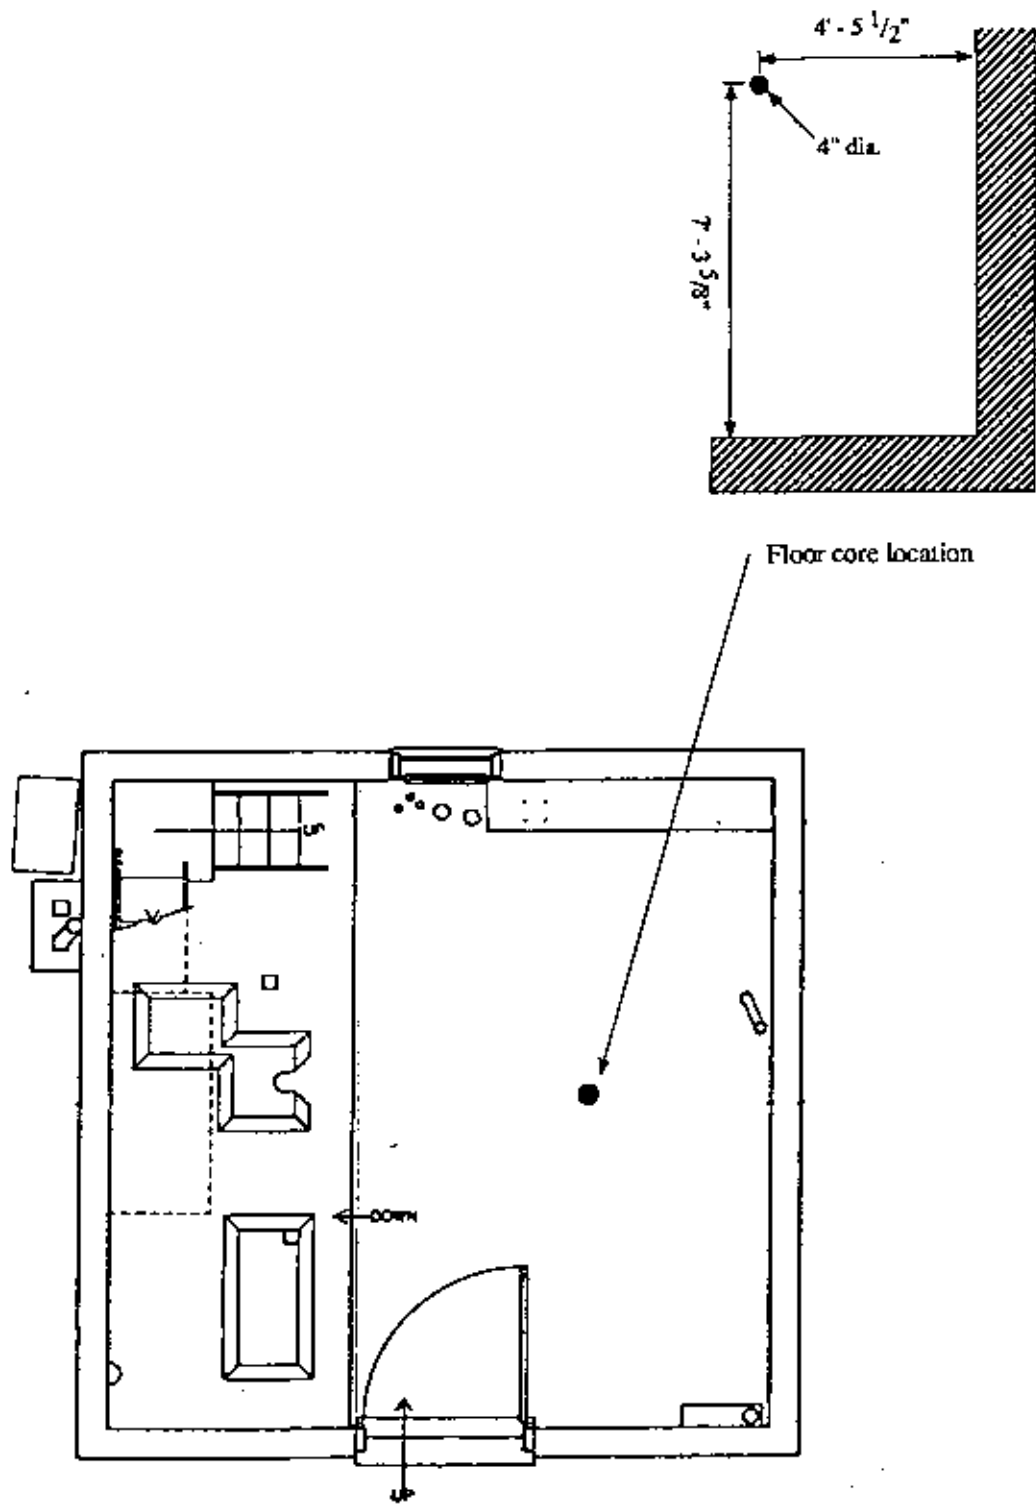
Melrose Smokehouse Plan - Location of Core on Interior
